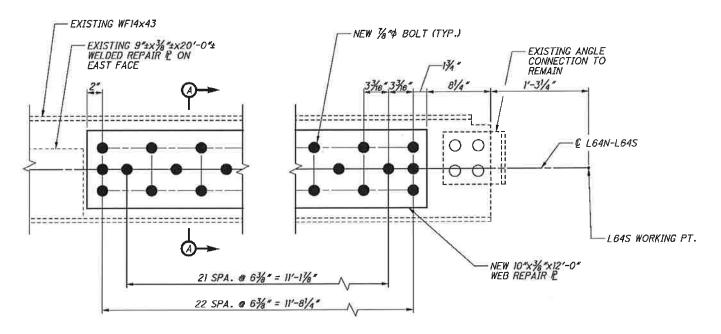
PANEL POINT 64 SWAY BRACE WEB REPAIR ELEVATION
